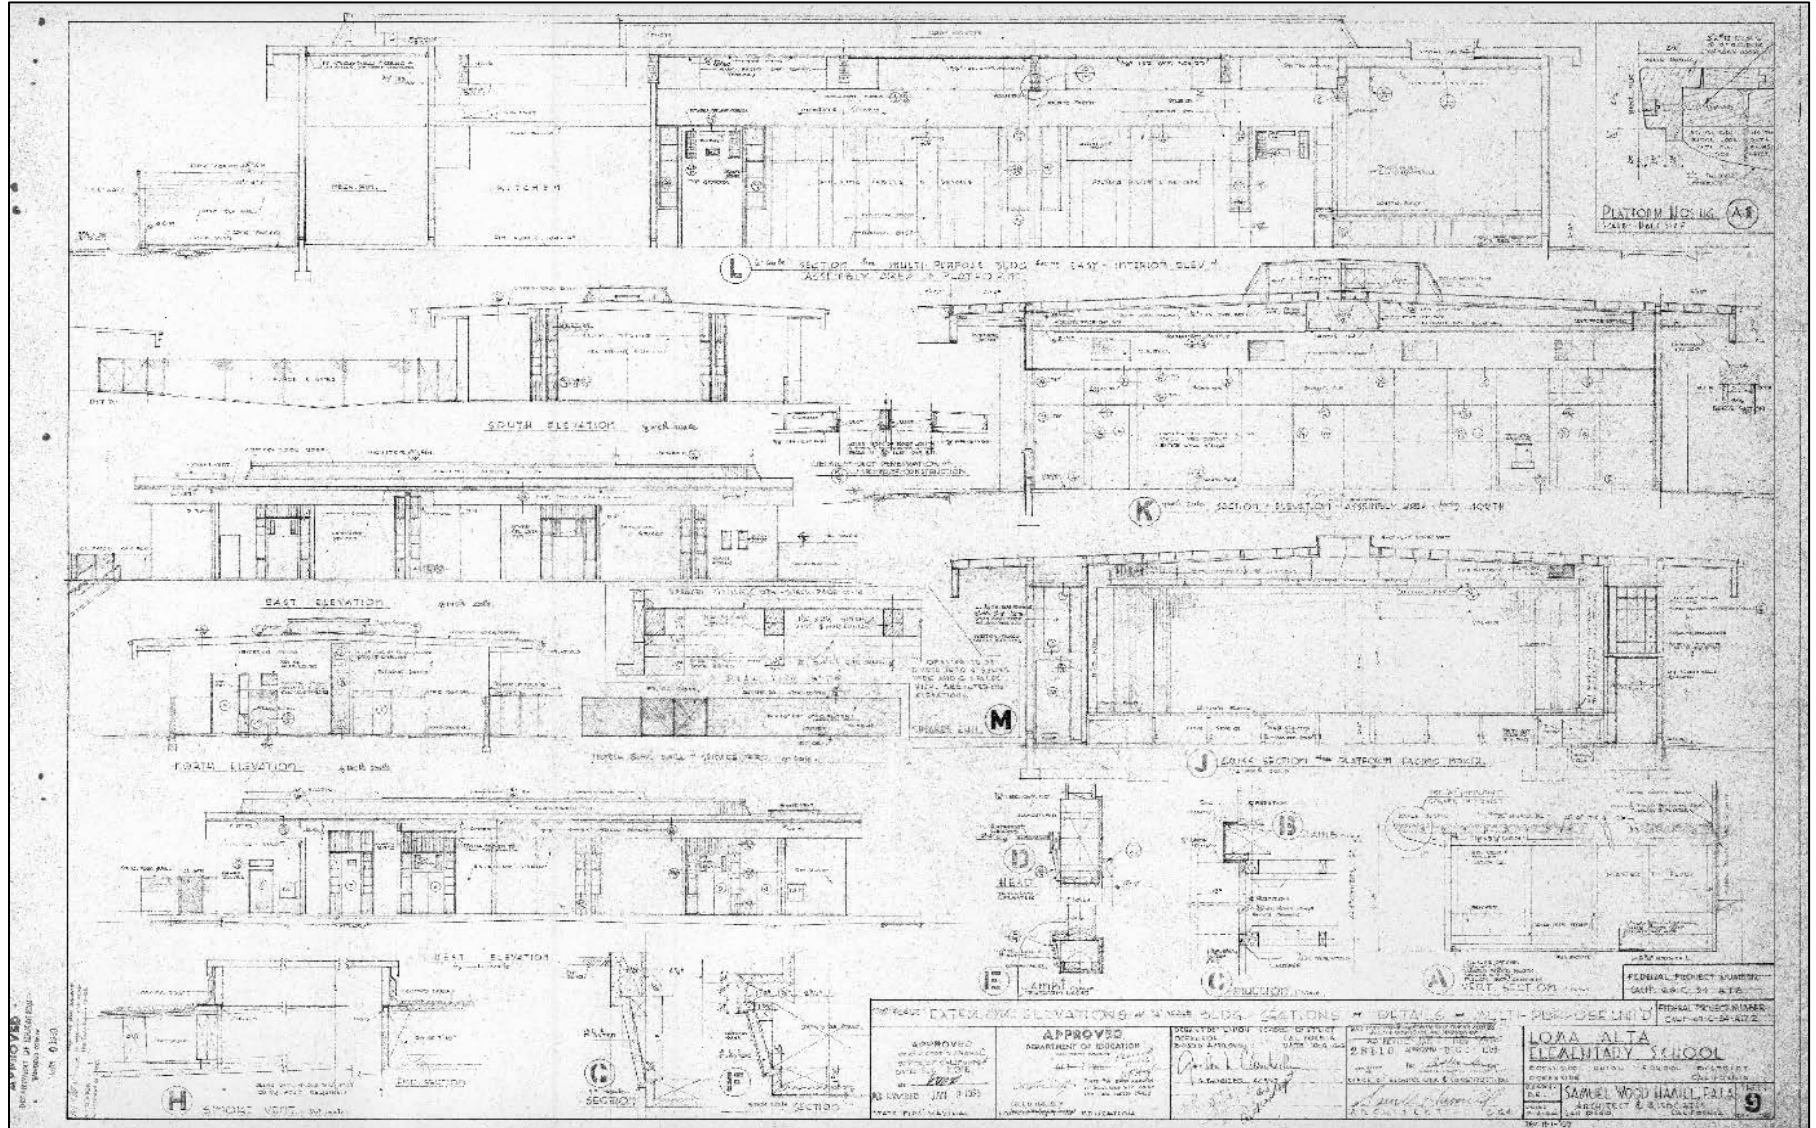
1966 Exterior Elevation and Building Sections Drawing, Sheet g. Source: San Diego History Center.
